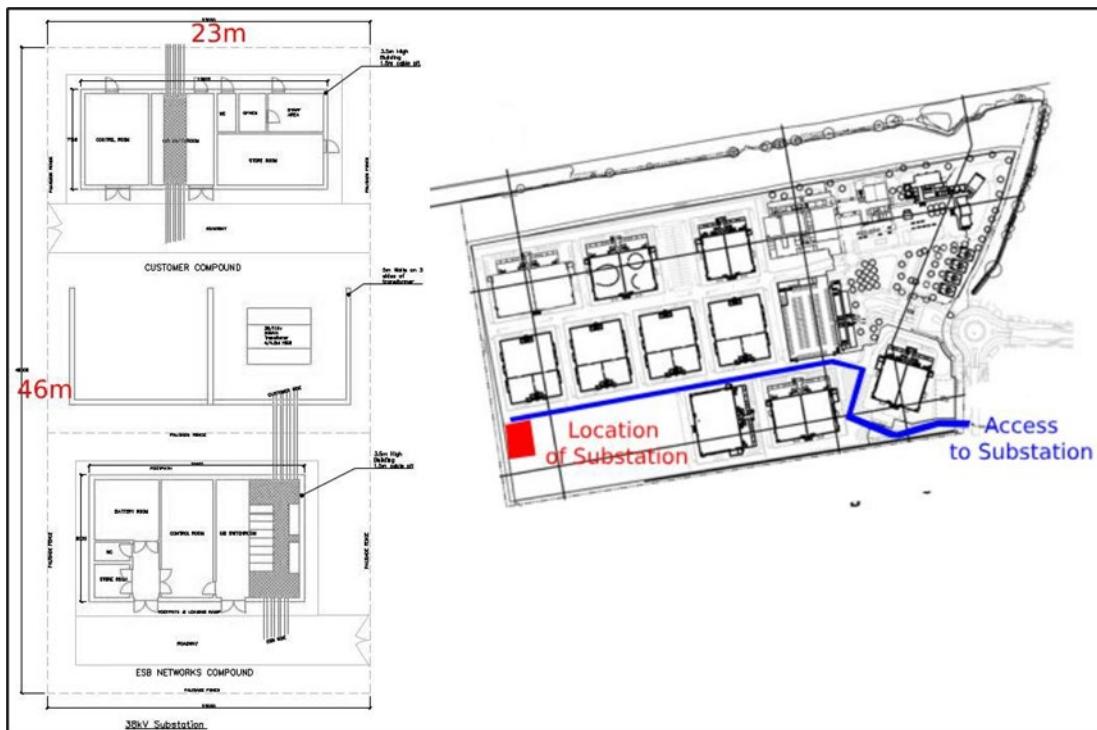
Plan view of the proposed sub-station and location plan indicating entrance and access.
